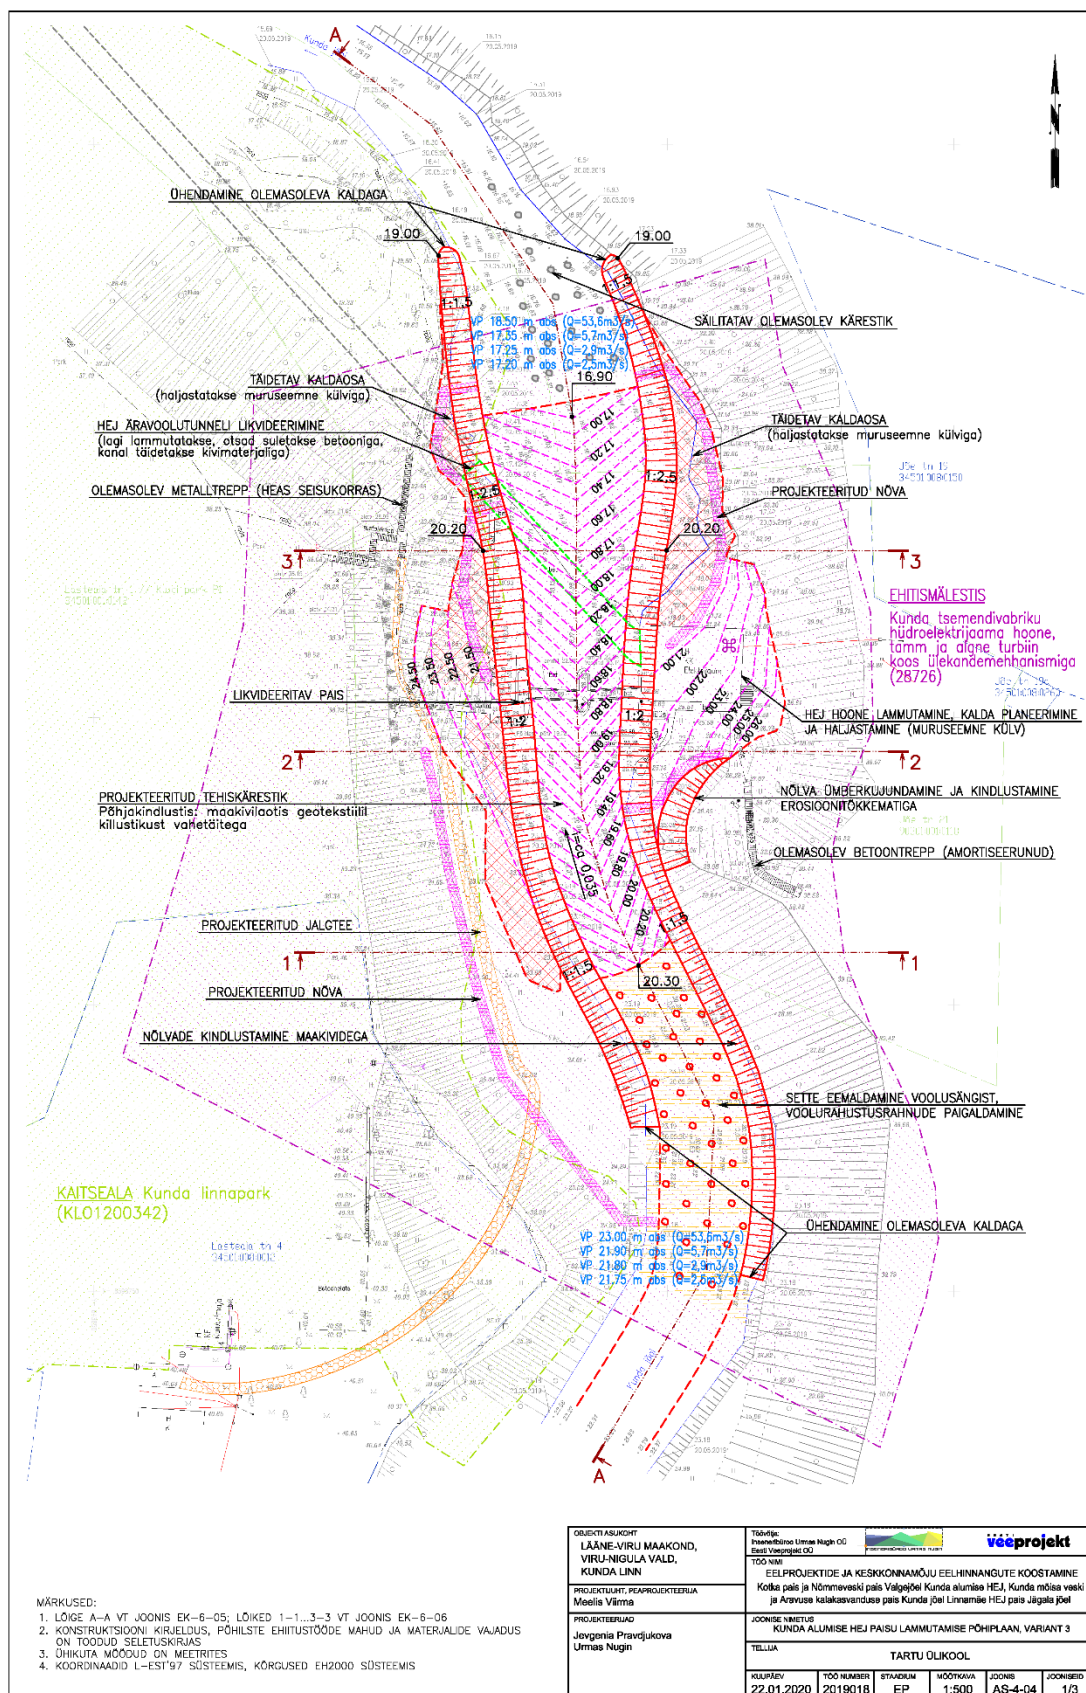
Design drawing (top view) of the third alternative solution for Kunda lower HEP dam.
